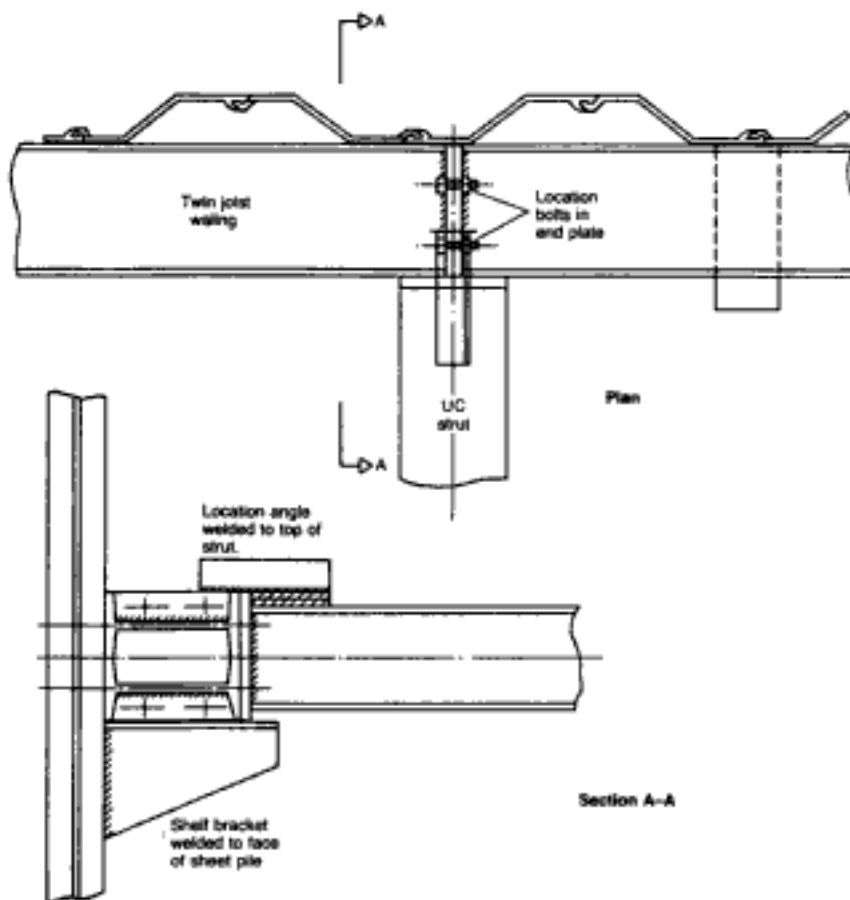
Detail of typical waling connection behind strut in light cofferdam steelwork
